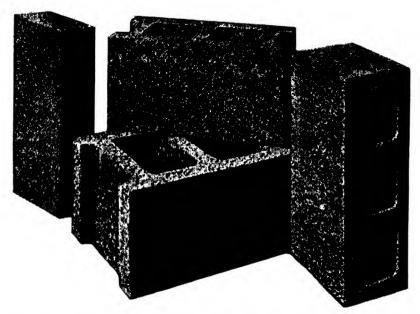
Various types of concrete building blocks. Other construction items made in concrete-products factories include sewer and drain pipe, ornamental light standards, precast concrete slabs, beams and columns, piling, fence posts, and blocks for building manholes. (Besser Manufacturing Company.)
